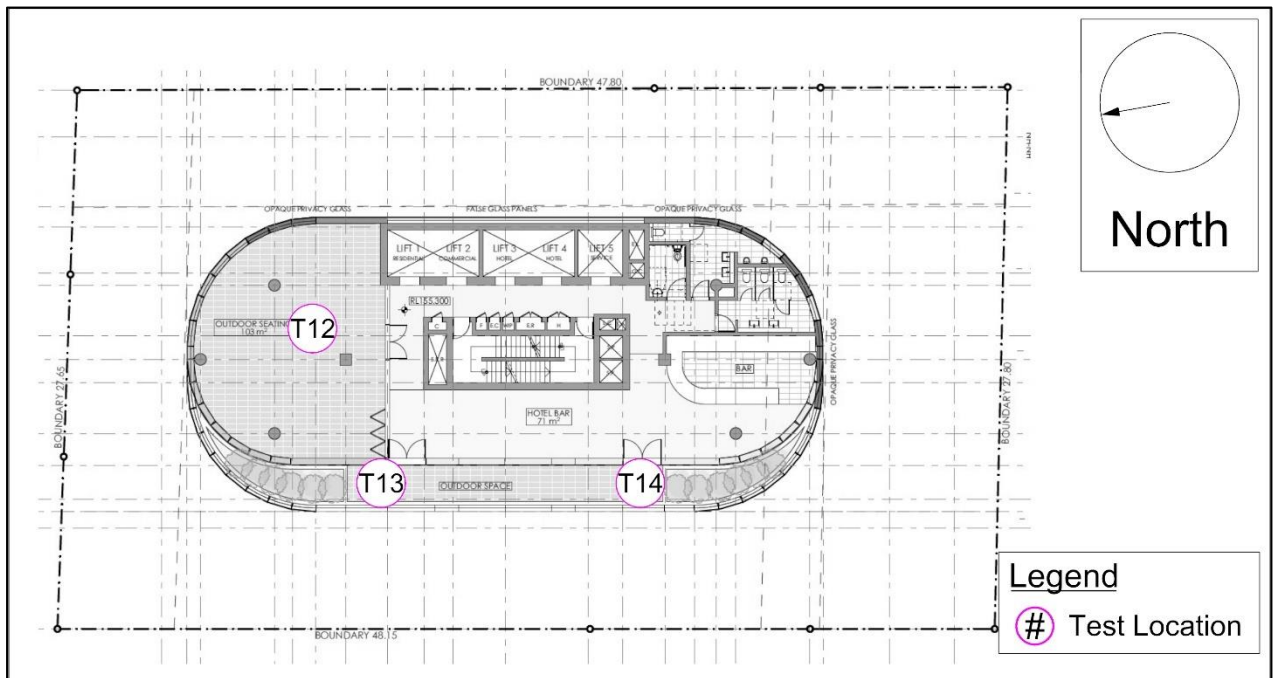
Level 37 Test Locations for the proposed 2-4 Burleigh Street and 20-24 Railway Parade Development.
